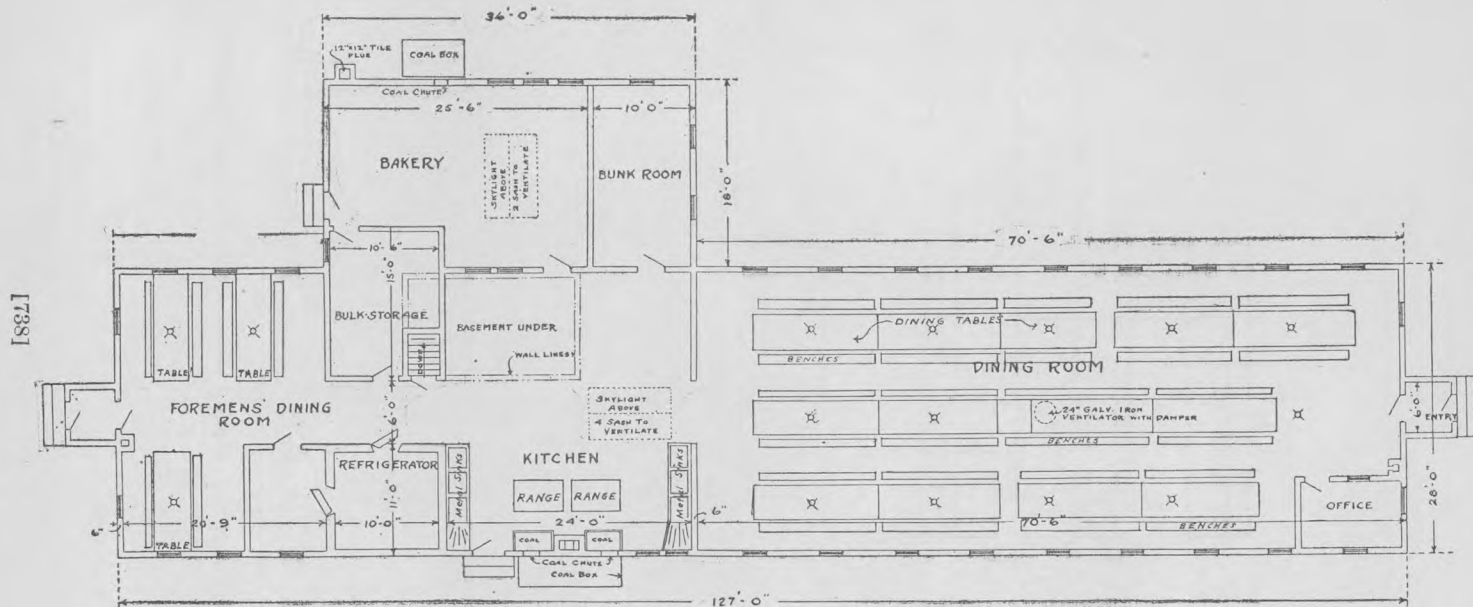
FLOOR PLAN OF THE BOARDING CAMP.
